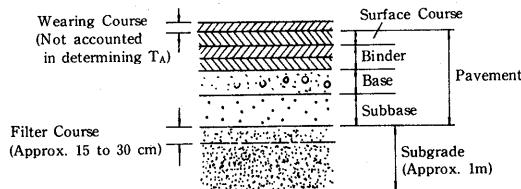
Typical Cross Section of Asphalt Pavement
